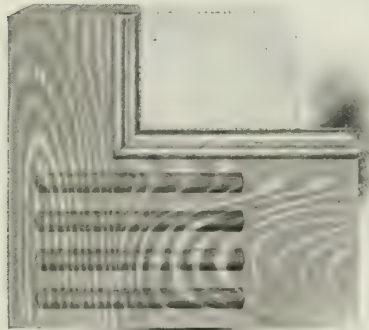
DOWEL CORNER CONSTRUCTION USED IN ALL WOOD DOORS AND SCREENS
